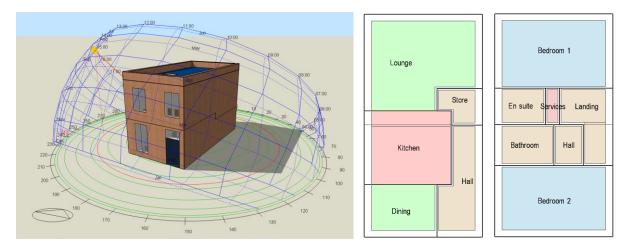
Model geometry and floor plans for Wikihouse Skylark two-bedroom detached house
